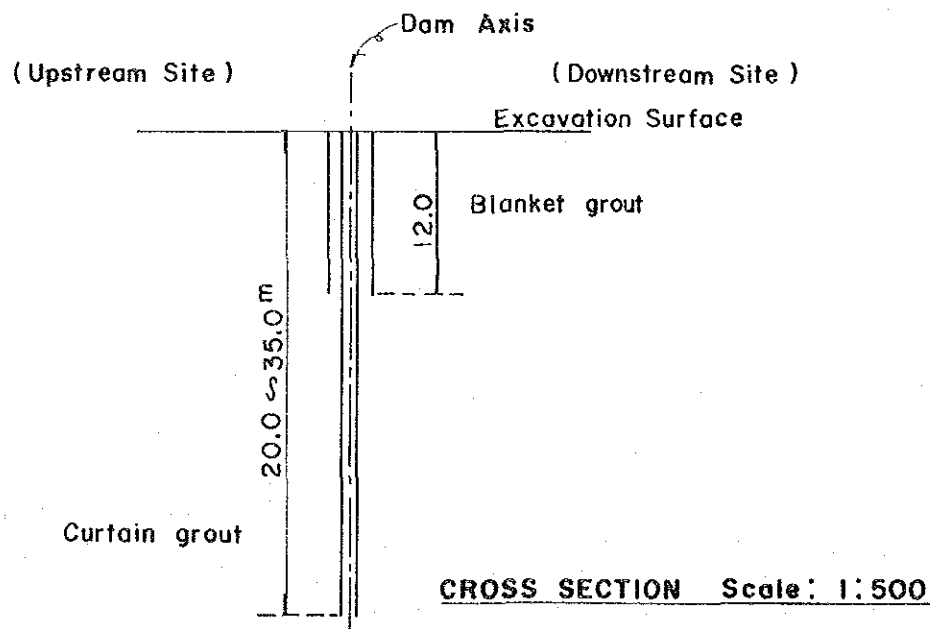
TYPICAL PATTERN OF GROUT FOR KEDUNGWARAK WEIR SITE
